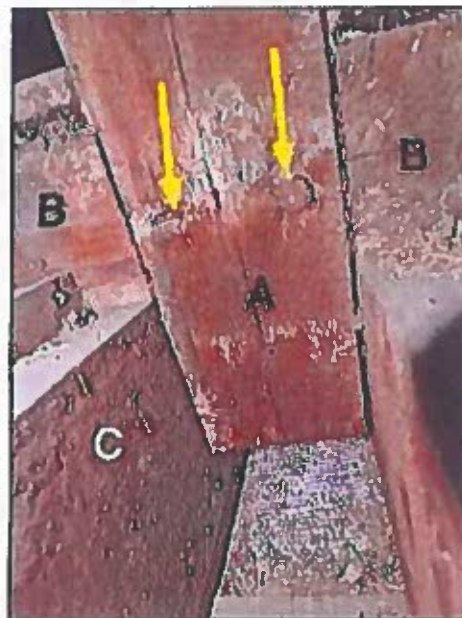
View of junction of ell loft wall framing with ceiling framing of first floor from within roof extension. Ceiling beam "C" apparently picks up wall loads from the original wall girt "B" and transfers the loads to the new north wall of the first floor. The original post "A" has been cut off just above the ceiling, but is joined to the girts "B" with mortise and tenon joints secured with pegs (arrows).
